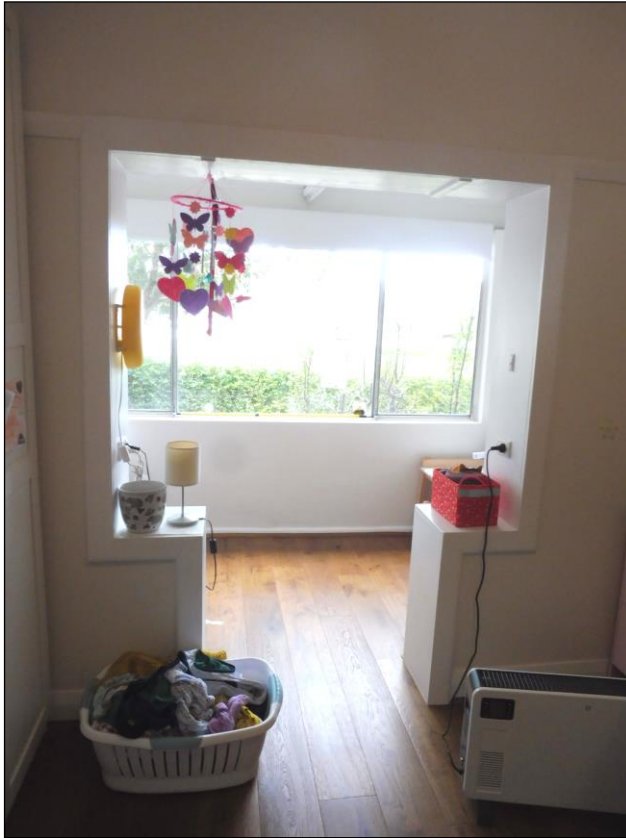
The front rooms generally retain early details. However, some modifications are evident. The door and sidelights accessing the former verandah have been removed and spaces connected. New flooring has been added to provide a level floor.
